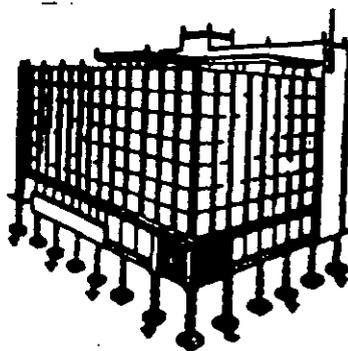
Steel building: Steel framing in tall buildings should be connected to air terminals. This type of structure requires special lightning protection.
